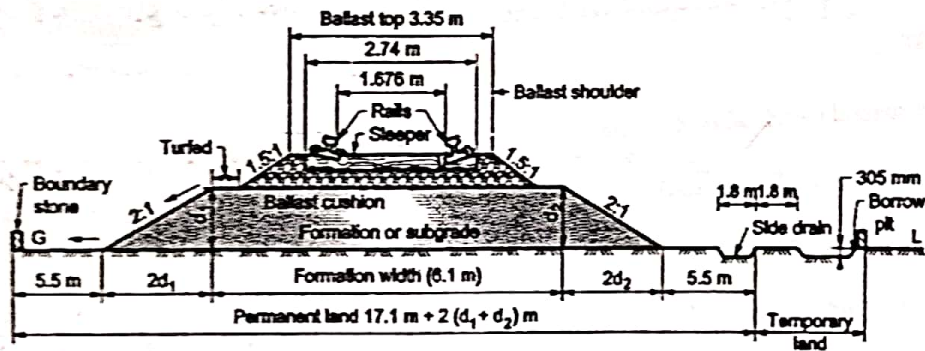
Cross-section of a single broad gauge track in embankment
